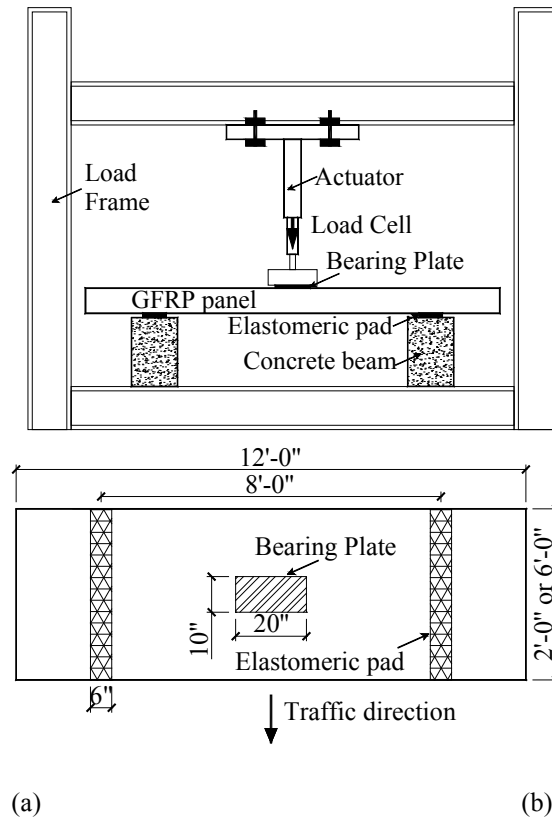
Test setup: (a) elevation; (b) plan (1 in. = 25.4 mm, 1 ft = 0.305 m)
